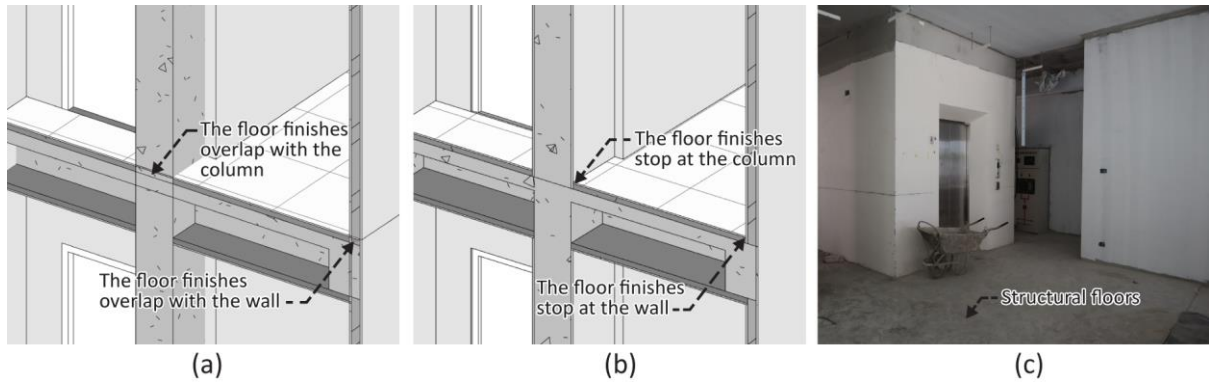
(a) Floor finishes in the original BIM model are under structural columns and walls. (b) Accurate floor finishes in the manually modified BIM model. (c) In the actual construction, the walls are constructed on the structural floors and the floor finishes are not yet installed.
